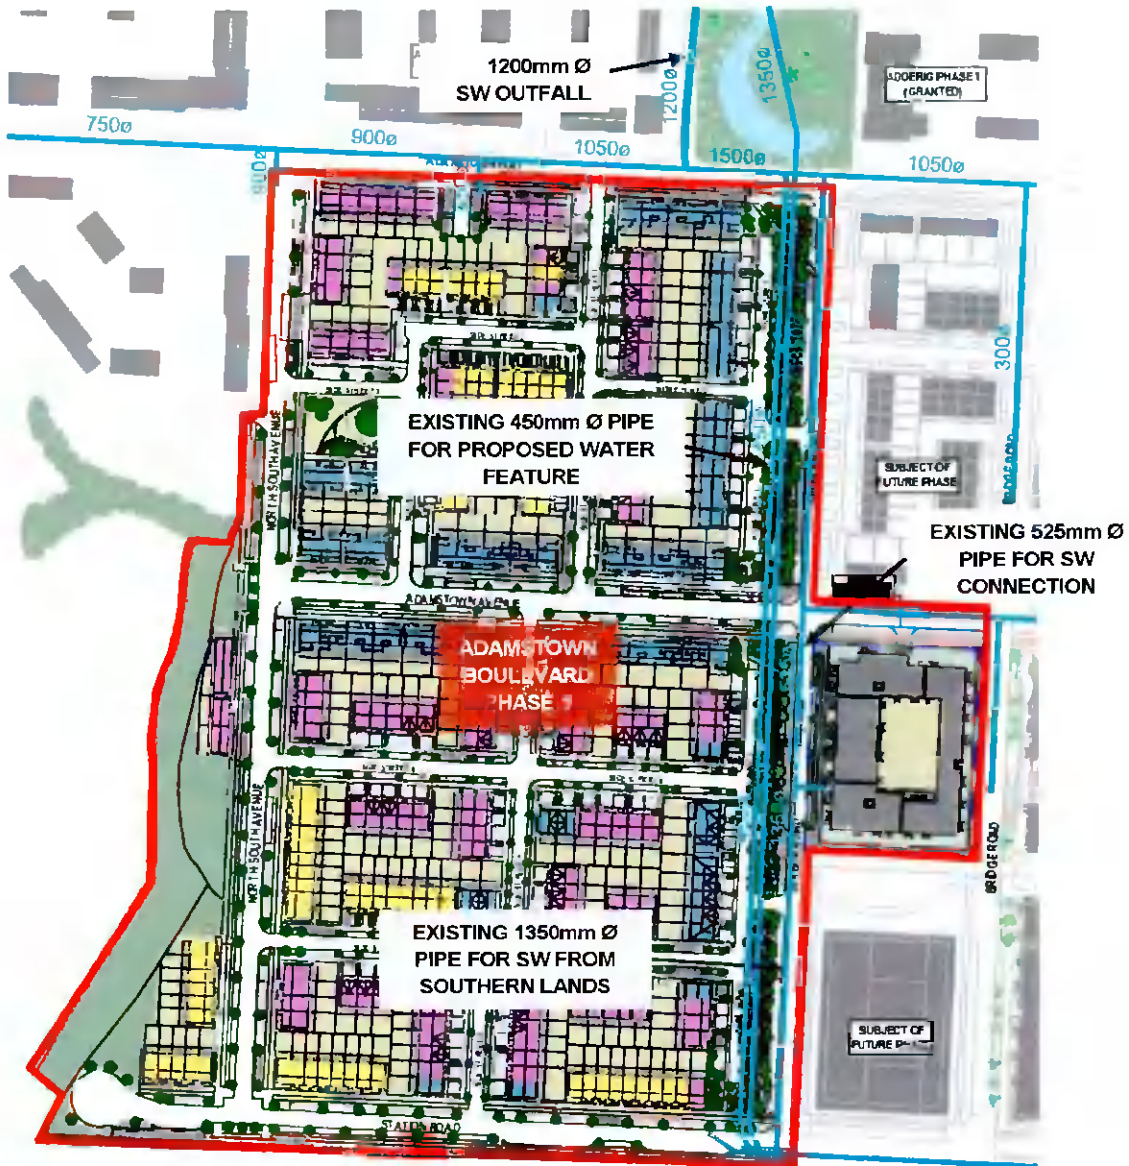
Existing Stormwater Drainage within Adamstown Boulevard Phase 1
